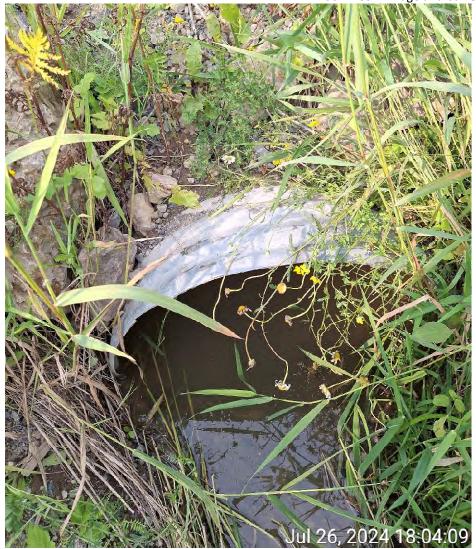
900mm culvert adjacent to inspected culvert. East end not found.
